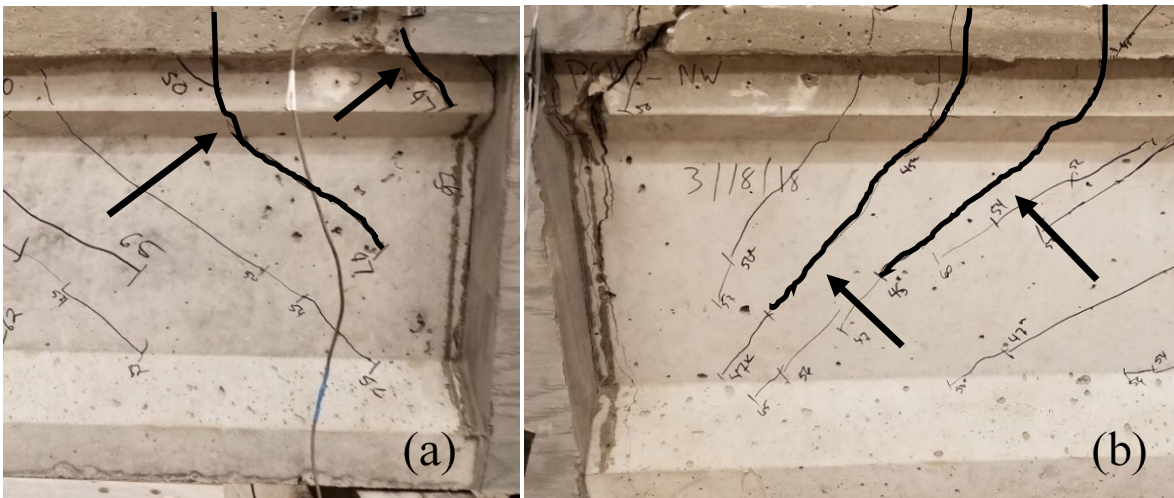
Flexure-shear cracking on the NC2-N girder at 47 kips of load (a) and flexure-shear cracking on the NC2-S girder at 45 kips of load (b). Arrows point to the dark lines that indicate the initial flexure-shear cracking.
